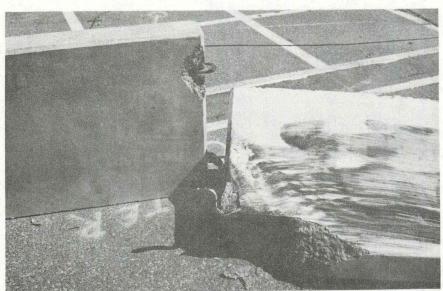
TEMPORARY CONCRETE BARRIER RAIL CONNECTOR DAMAGE
